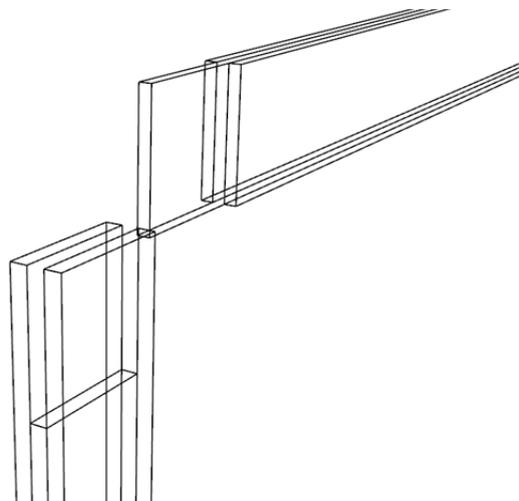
Broadfield house glass museum adhesive bonding beam and column
